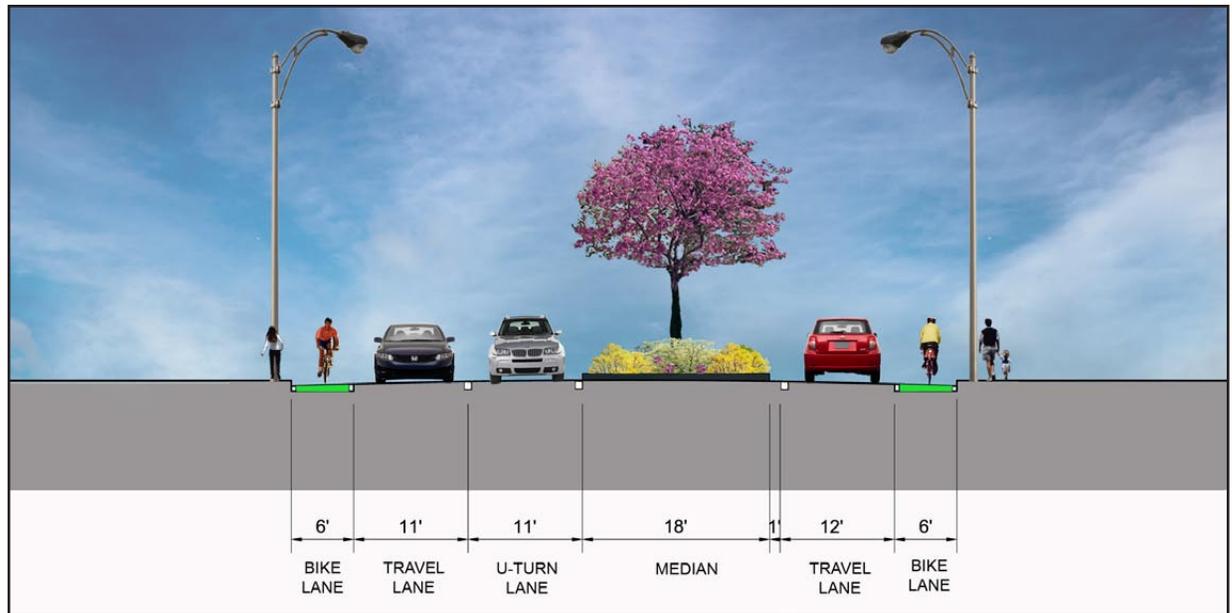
Durfee Avenue west of South El Monte High School entrance, facing north — Proposed.
